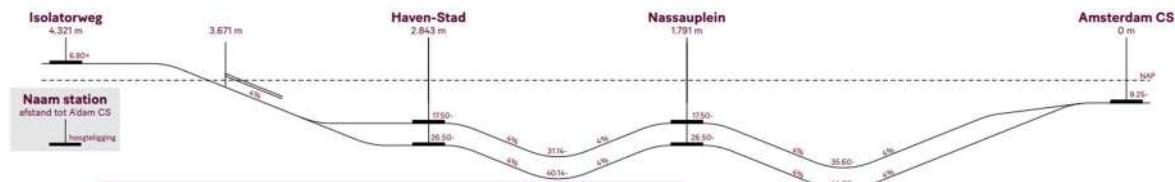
Longitudinal dimensions tunnel (MASH Report, 2020)
